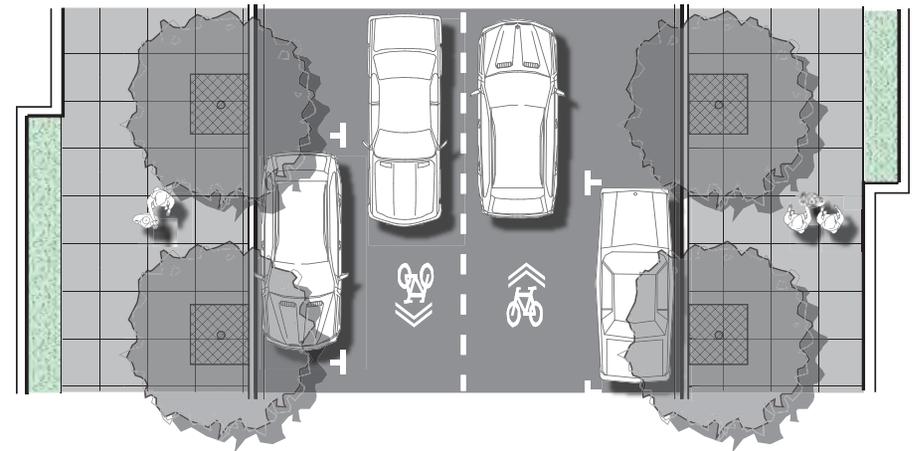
Section 6d: North 'A' Street looking north in the Northern District, Noddin Avenue, and Burton Road
